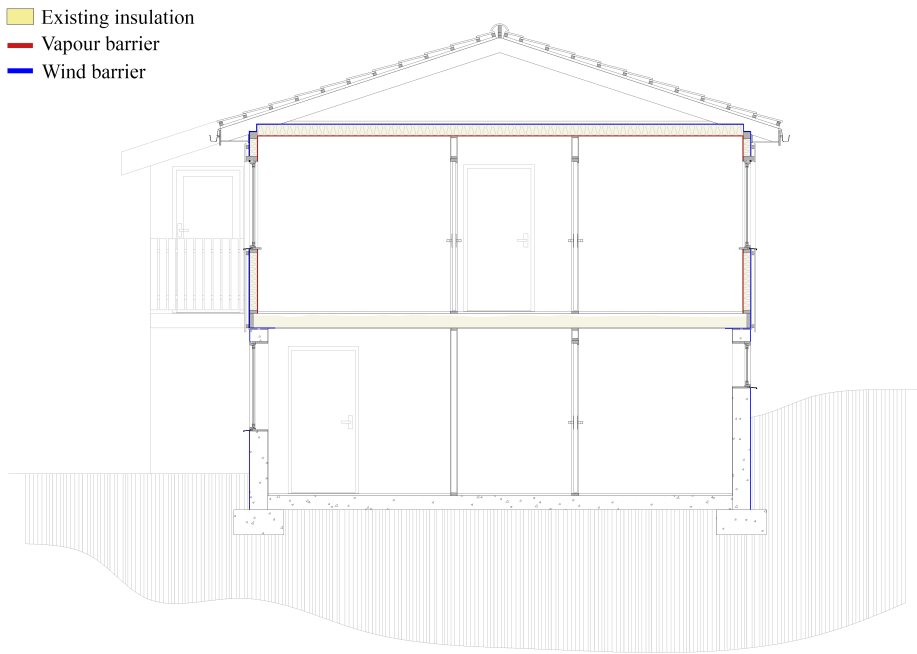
Section of a typical single-family house with the insulation layer, wind barrier and vapour barrier marked.
